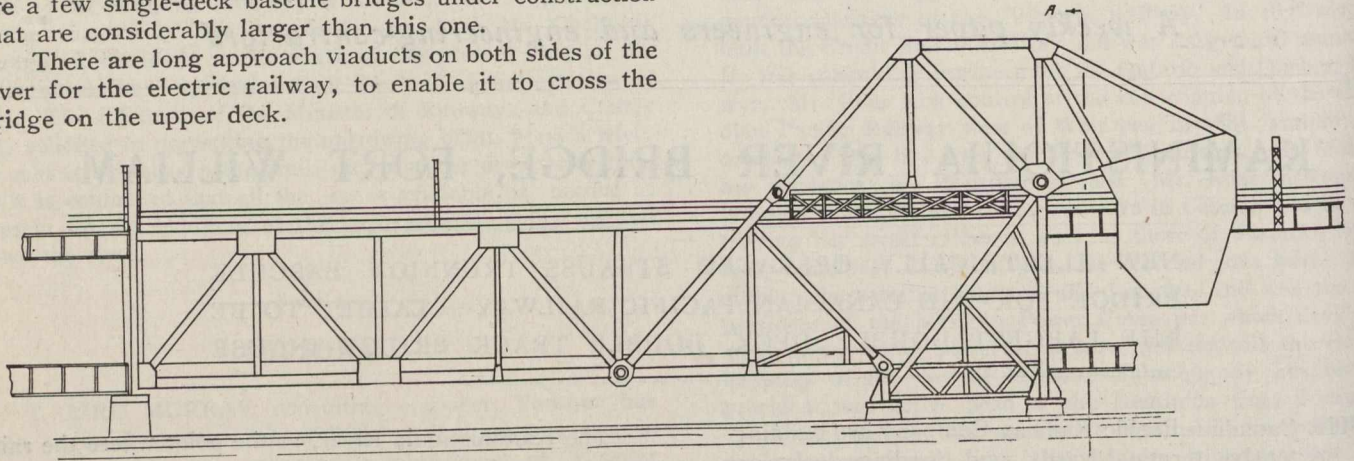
Kaministiquia River Bridge, showing General Elevation Diagram.
